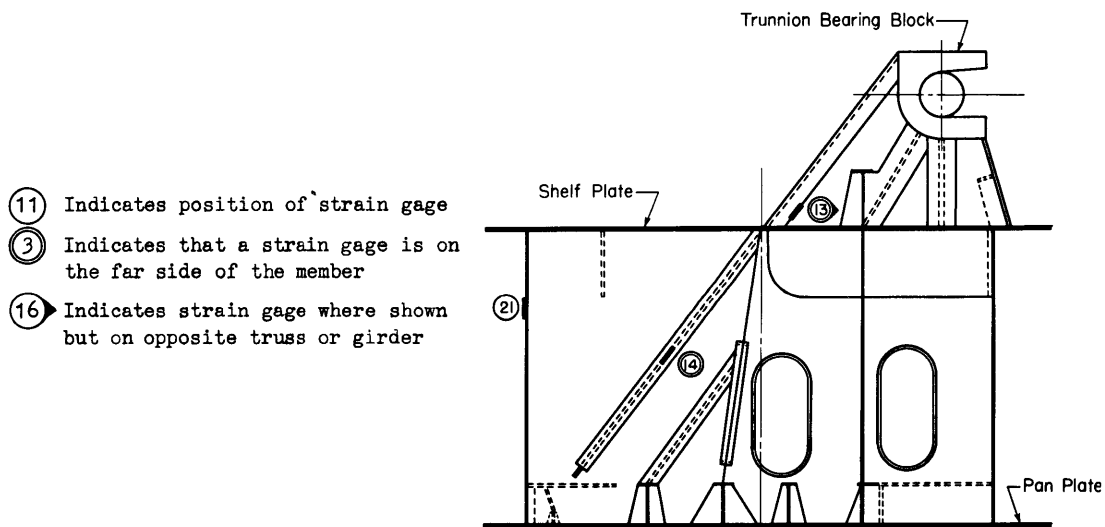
Elevation of Starboard Girder, Showing Locations of Metaelectric Strain Gages
